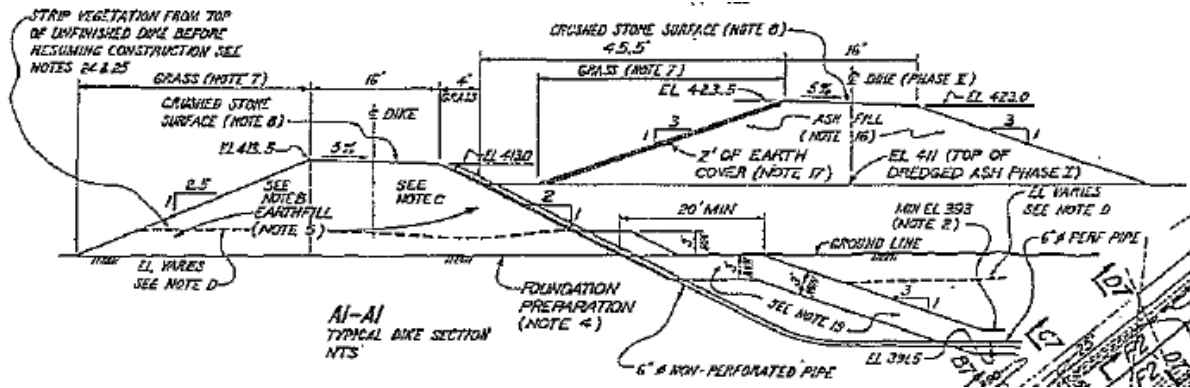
Design Cross-Section of Perimeter Dikes from TVA Drawing 10W218-1
